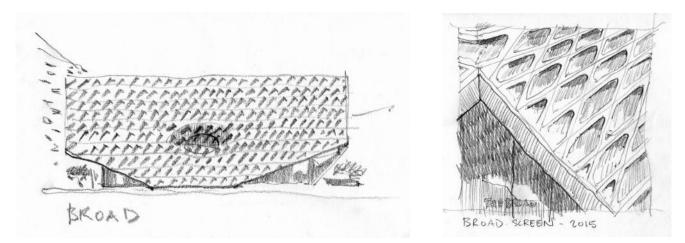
Broad Museum, Los Angeles, 2015, DS+R Architects. Elevation and close-up views. The façade reads as a perforated structural shell, but is made of thin GFRC panels on a curtain wall framing system.
